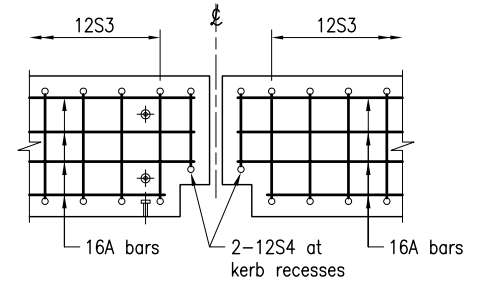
BRIDGE TRAFFIC POST ANCHORAGE GROUP SETOUT
